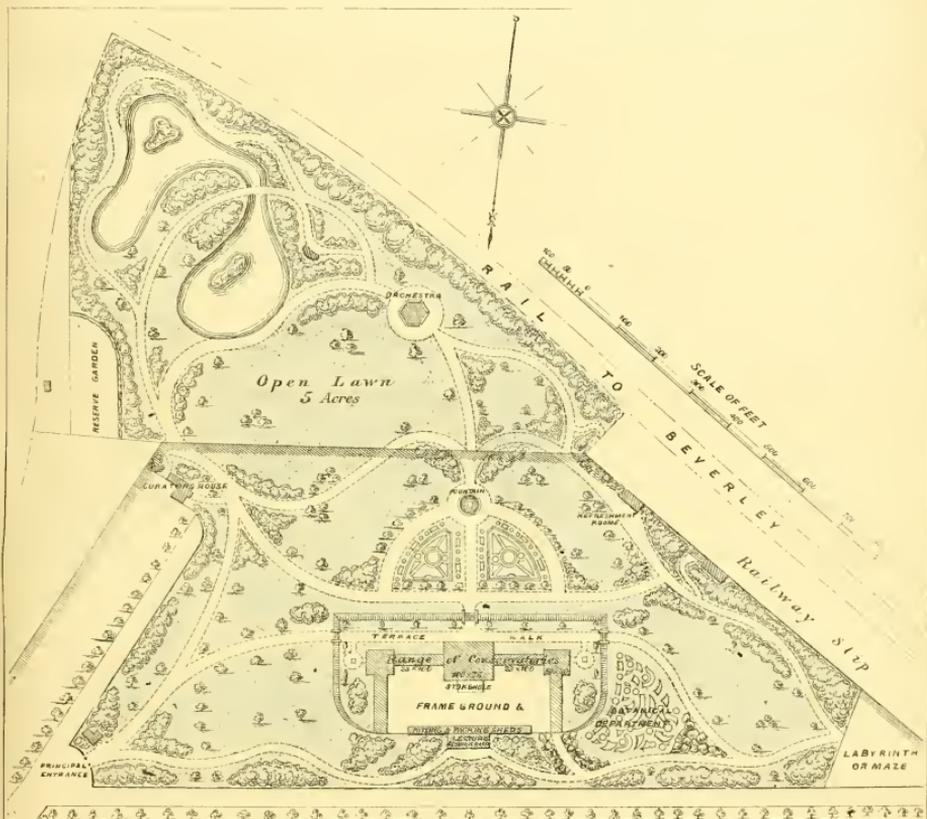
PLAN OF THE PROPOSED NEW BOTANIC GARDEN AT HULL.
